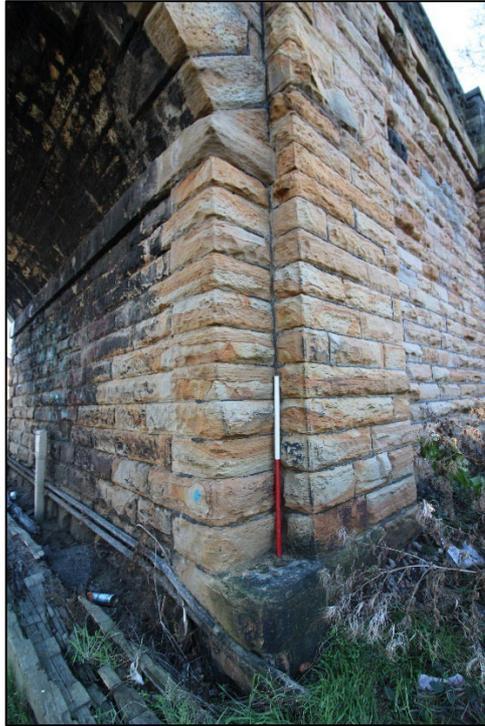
Plinth beneath eastern abutment with 1m scale. View facing east (IMG_0417)
